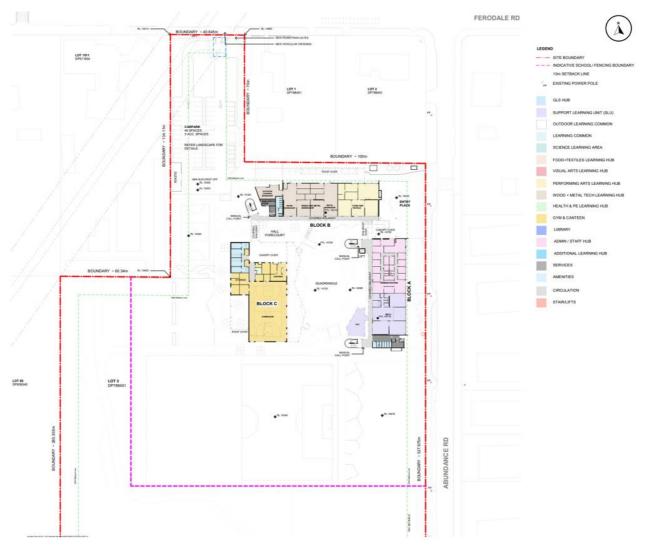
Proposed Ground Level Plan (Source: NBRS)
